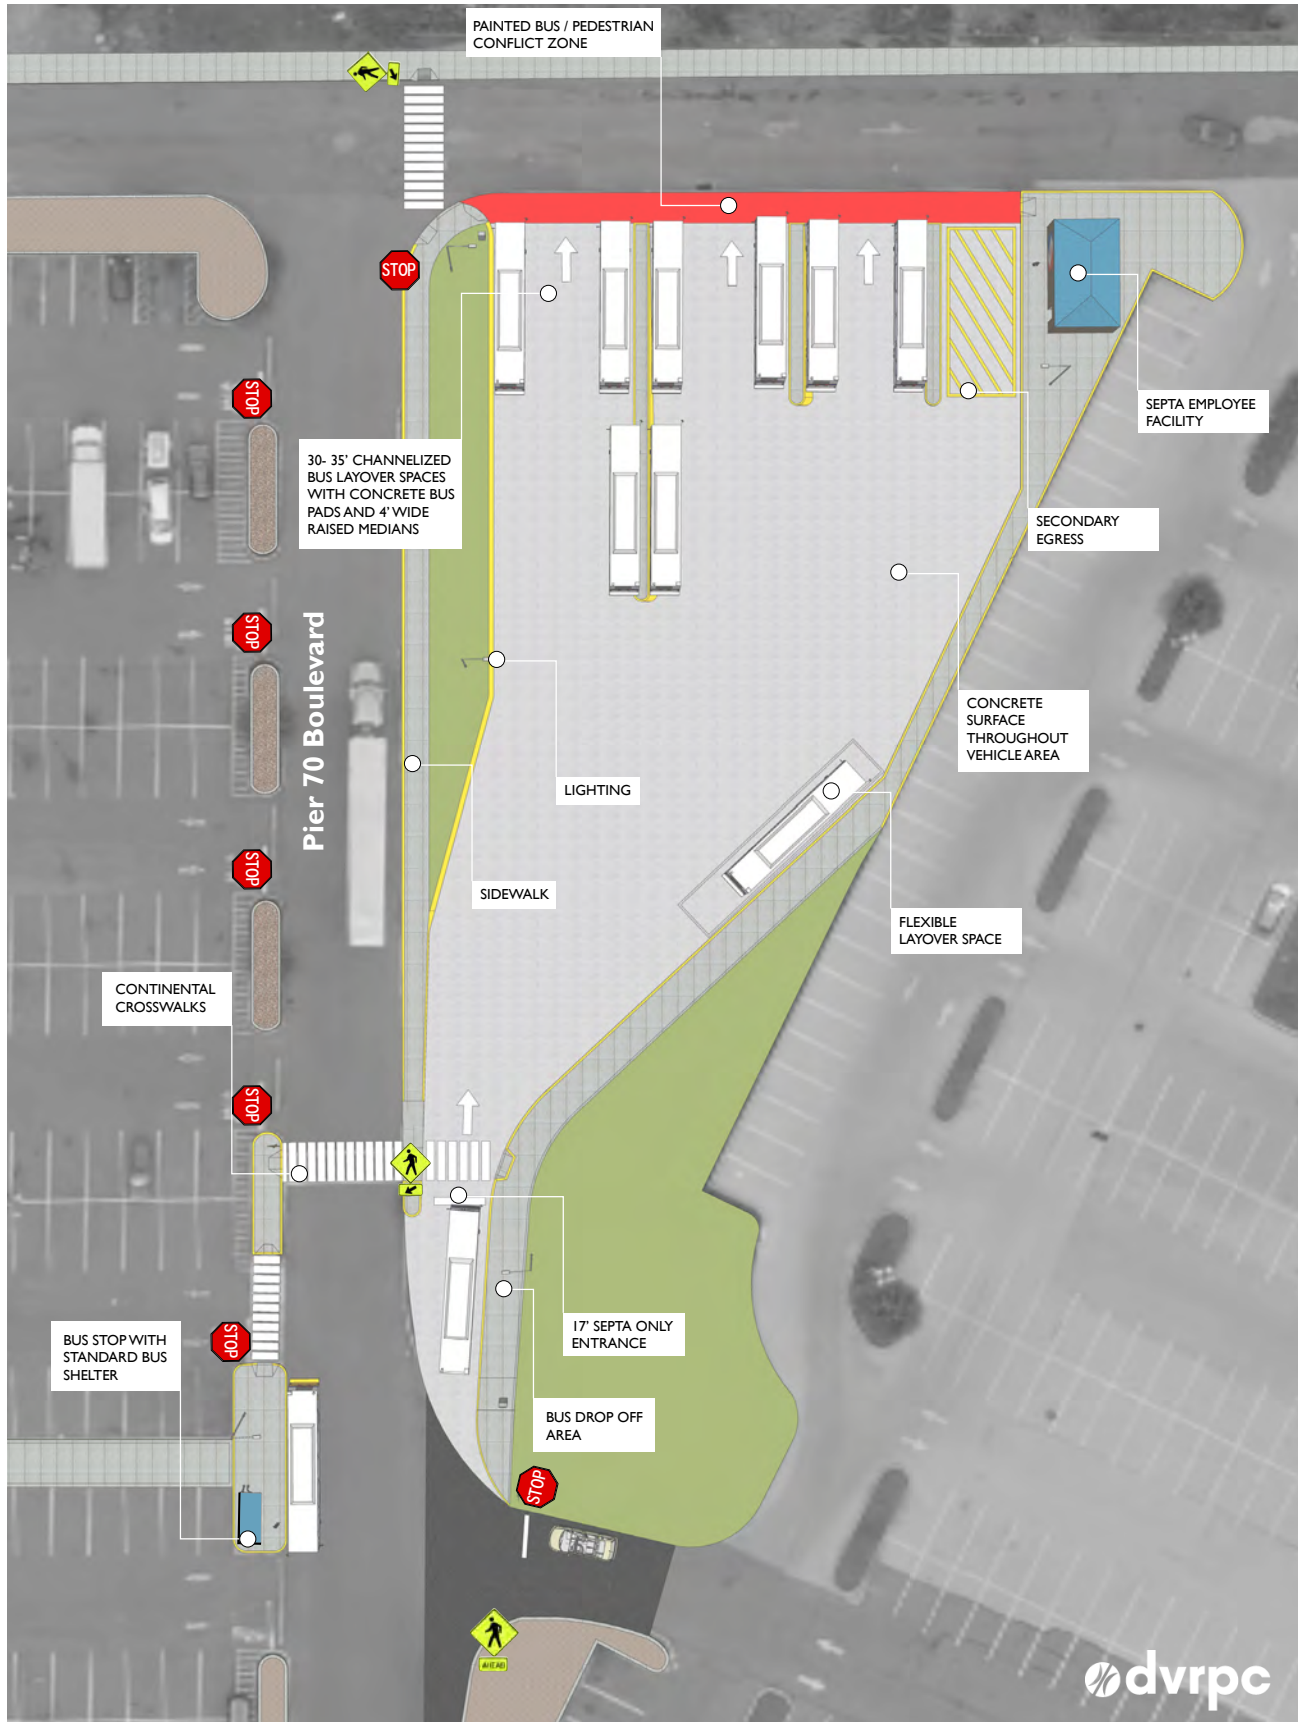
shows the design of a Pier 70 transit facility. This design has four points of focus: site access, maneuverability, walkability, and maximizing vehicle layover spaces. Vehicles will enter the site through a new access point on the west side of the existing parking lot. This entrance includes a drop-off area where all remaining customers would alight from the vehicle. This new stop allows buses to pull completely out of traffic and includes a pedestrian connection that leads to a sidewalk connecting to Walmart. This design also seeks to improve traffic movements and visibility by reshaping the existing intersection just west of the entrance to create a more perpendicular stop location for vehicles turning onto Pier 70 Boulevard from the south.
